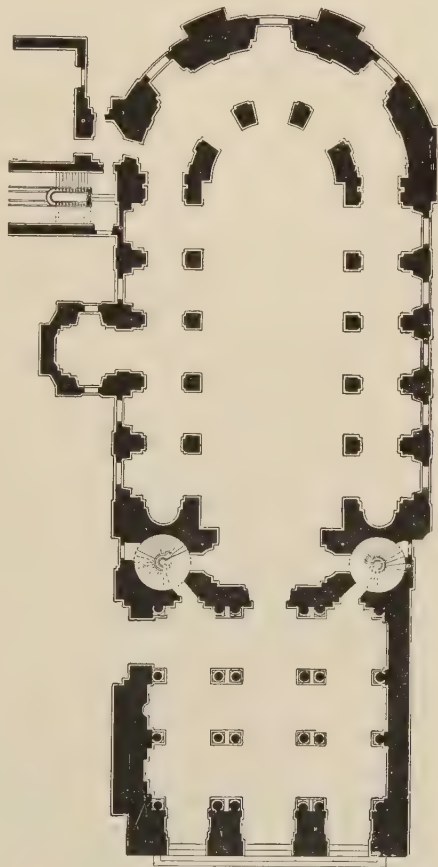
PLAN OF CHAPEL OF VERSAILLES
